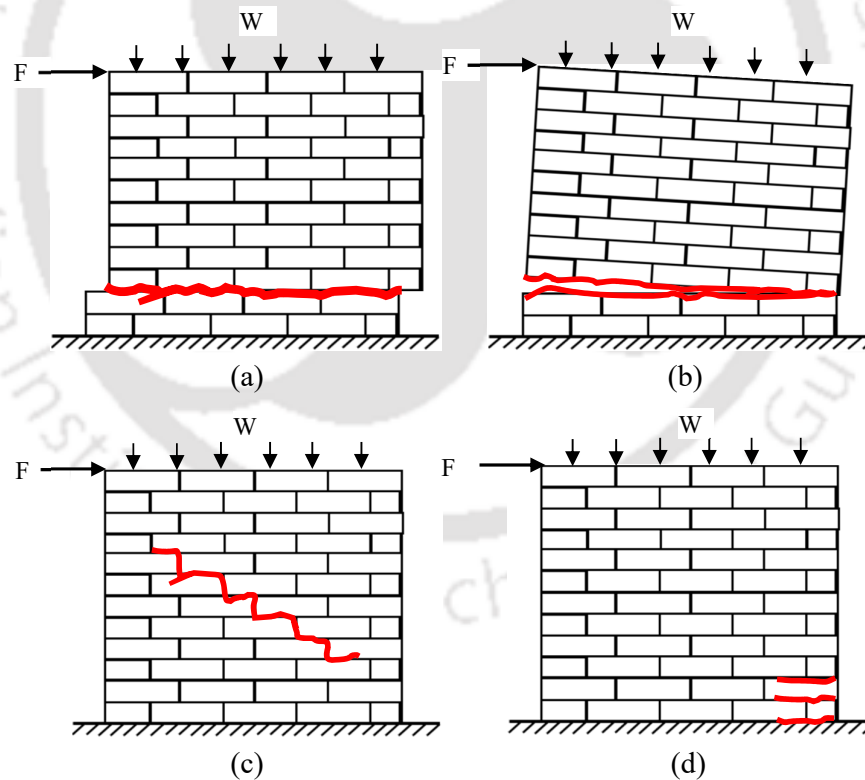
In-plane Failure pattern of masonry walls: (a) shear failure, (b) rocking/flexural failure, (c) diagonal shear failure, and (d) toe crushing failure.
